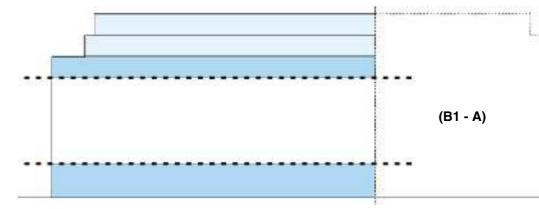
Plot B1B Elevation - - top, middle, bottom
